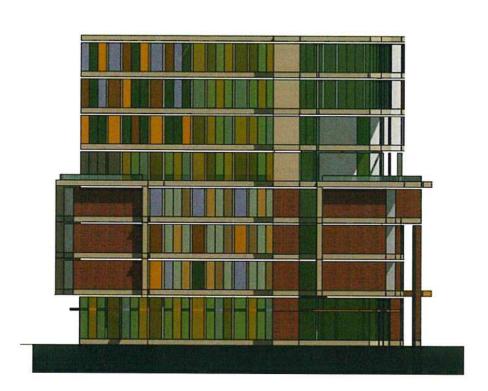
Building Elevation - The Architectural Grid West Elevation Source - B. Kimball
